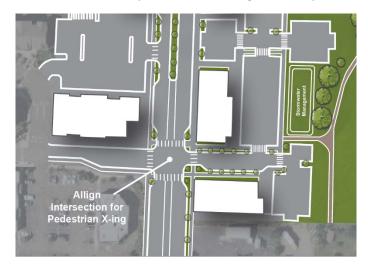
Align driveways to facilitate pedestrian crossings throughout the Sidney Road SW corridor.
